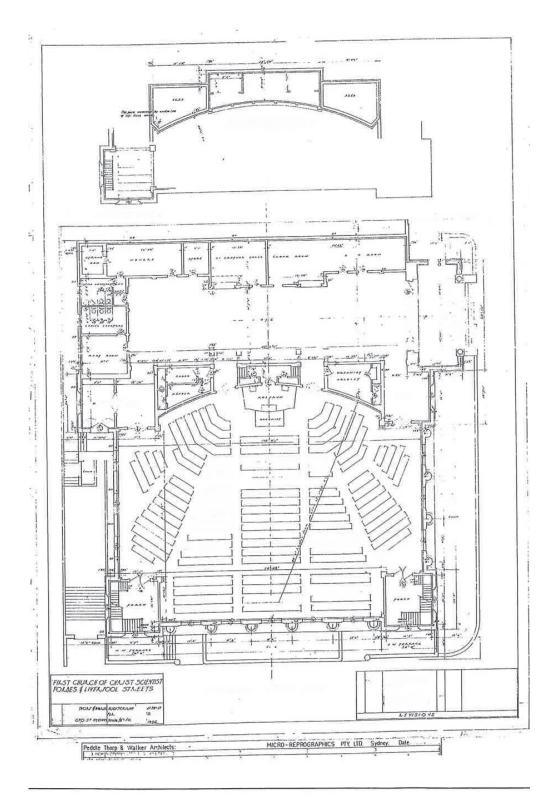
Auditorium floor plan, 1926 (Source: Conservation Plan 2000)
